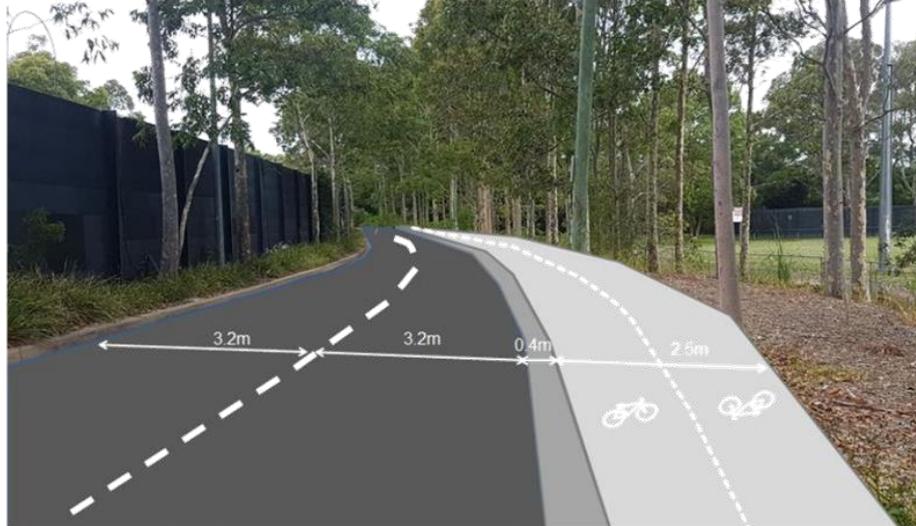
typical example of separated bi-directional cycleway and work required in Canal Rd
